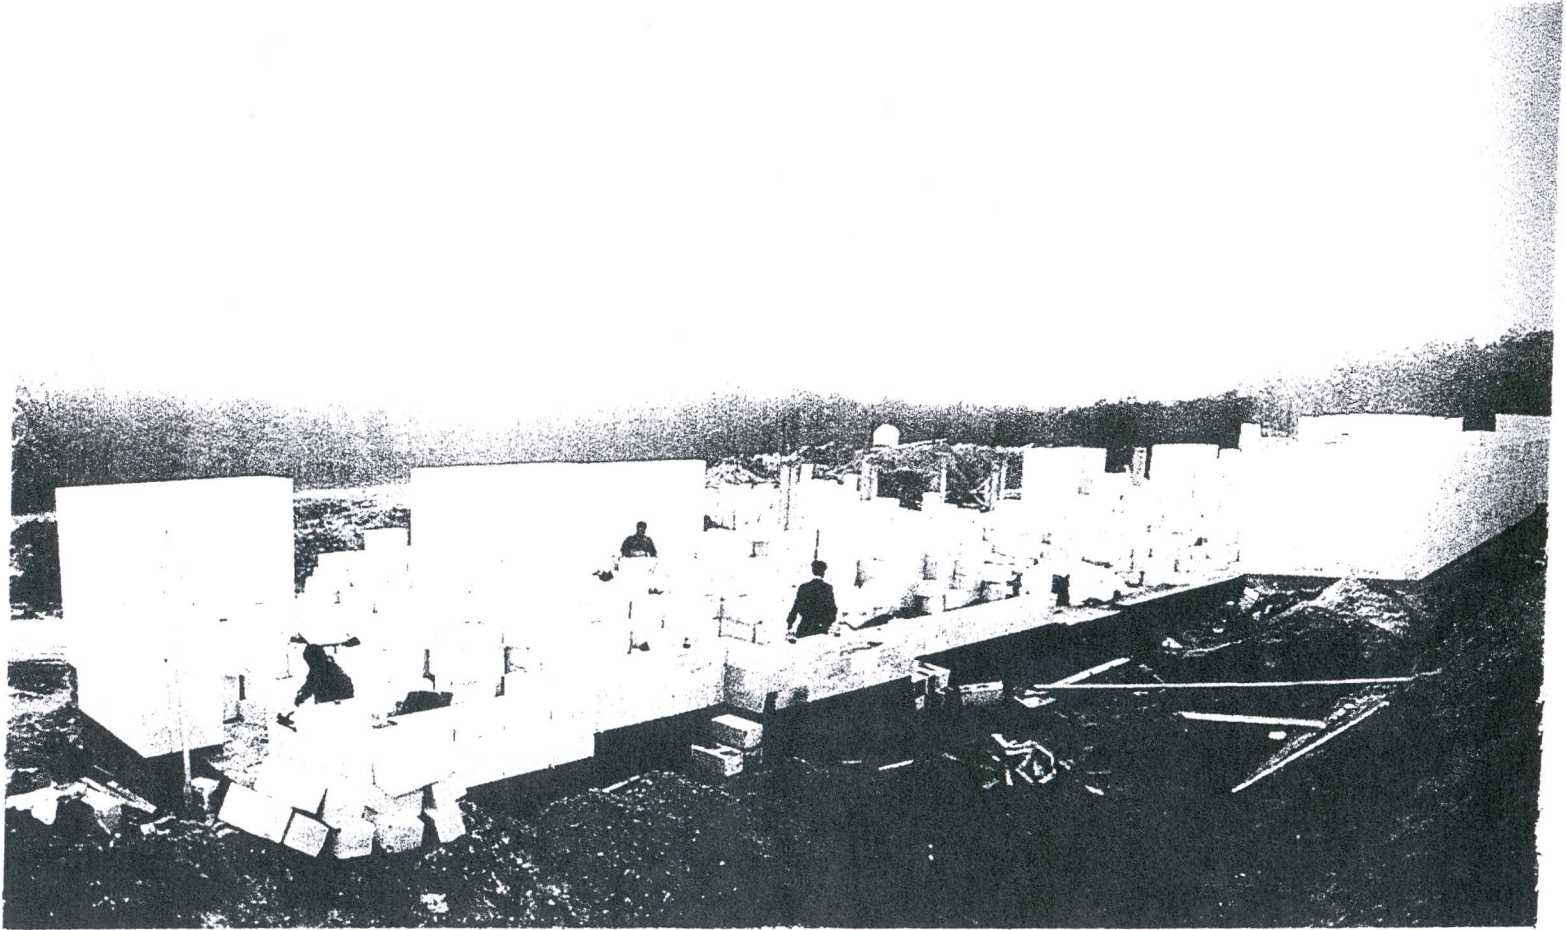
Tekirdağ House, The building was seen like a lego land at the construction Stage. '6000 stone house game' (Source: Yapı 206, 1999)
